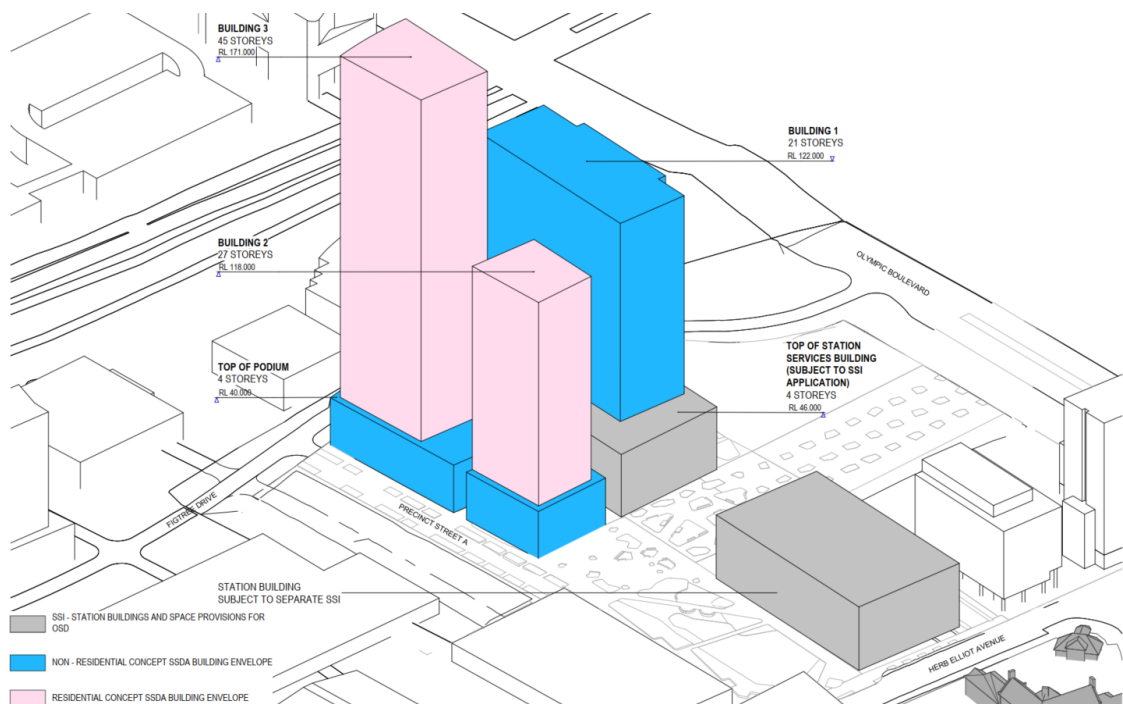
Proposed Concept SSDA development and CSSI scope
